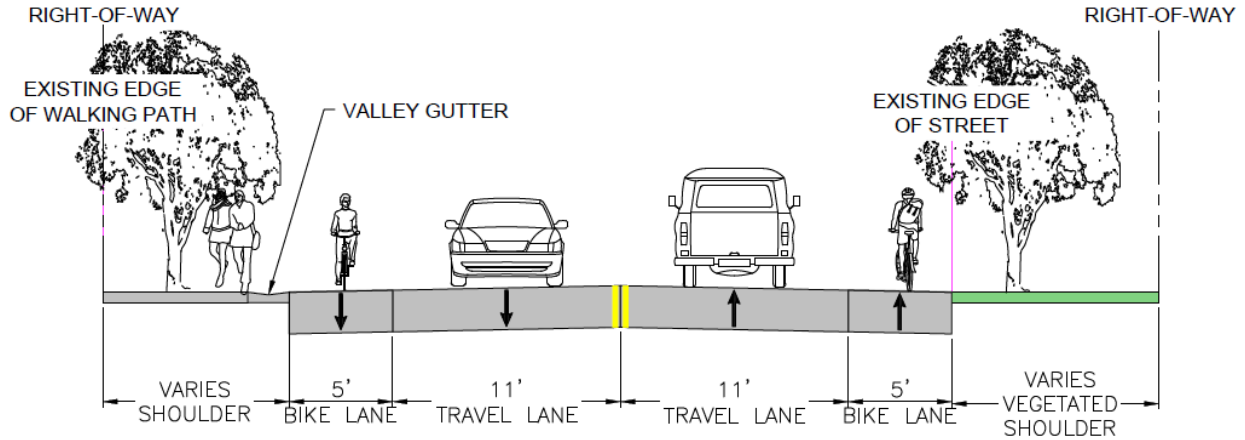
Ringwood Avenue Existing Cross Section (Menlo Oaks) Looking North Toward Bay Road
